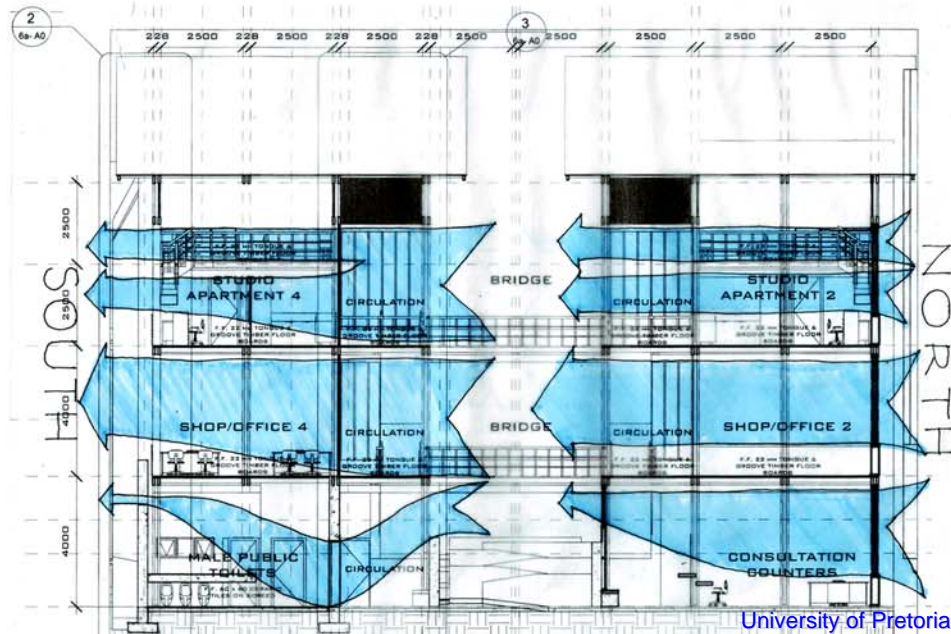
LONGITUDINAL SECTION WITH CROSS VENTILATION (AUTHOR, 2006).
